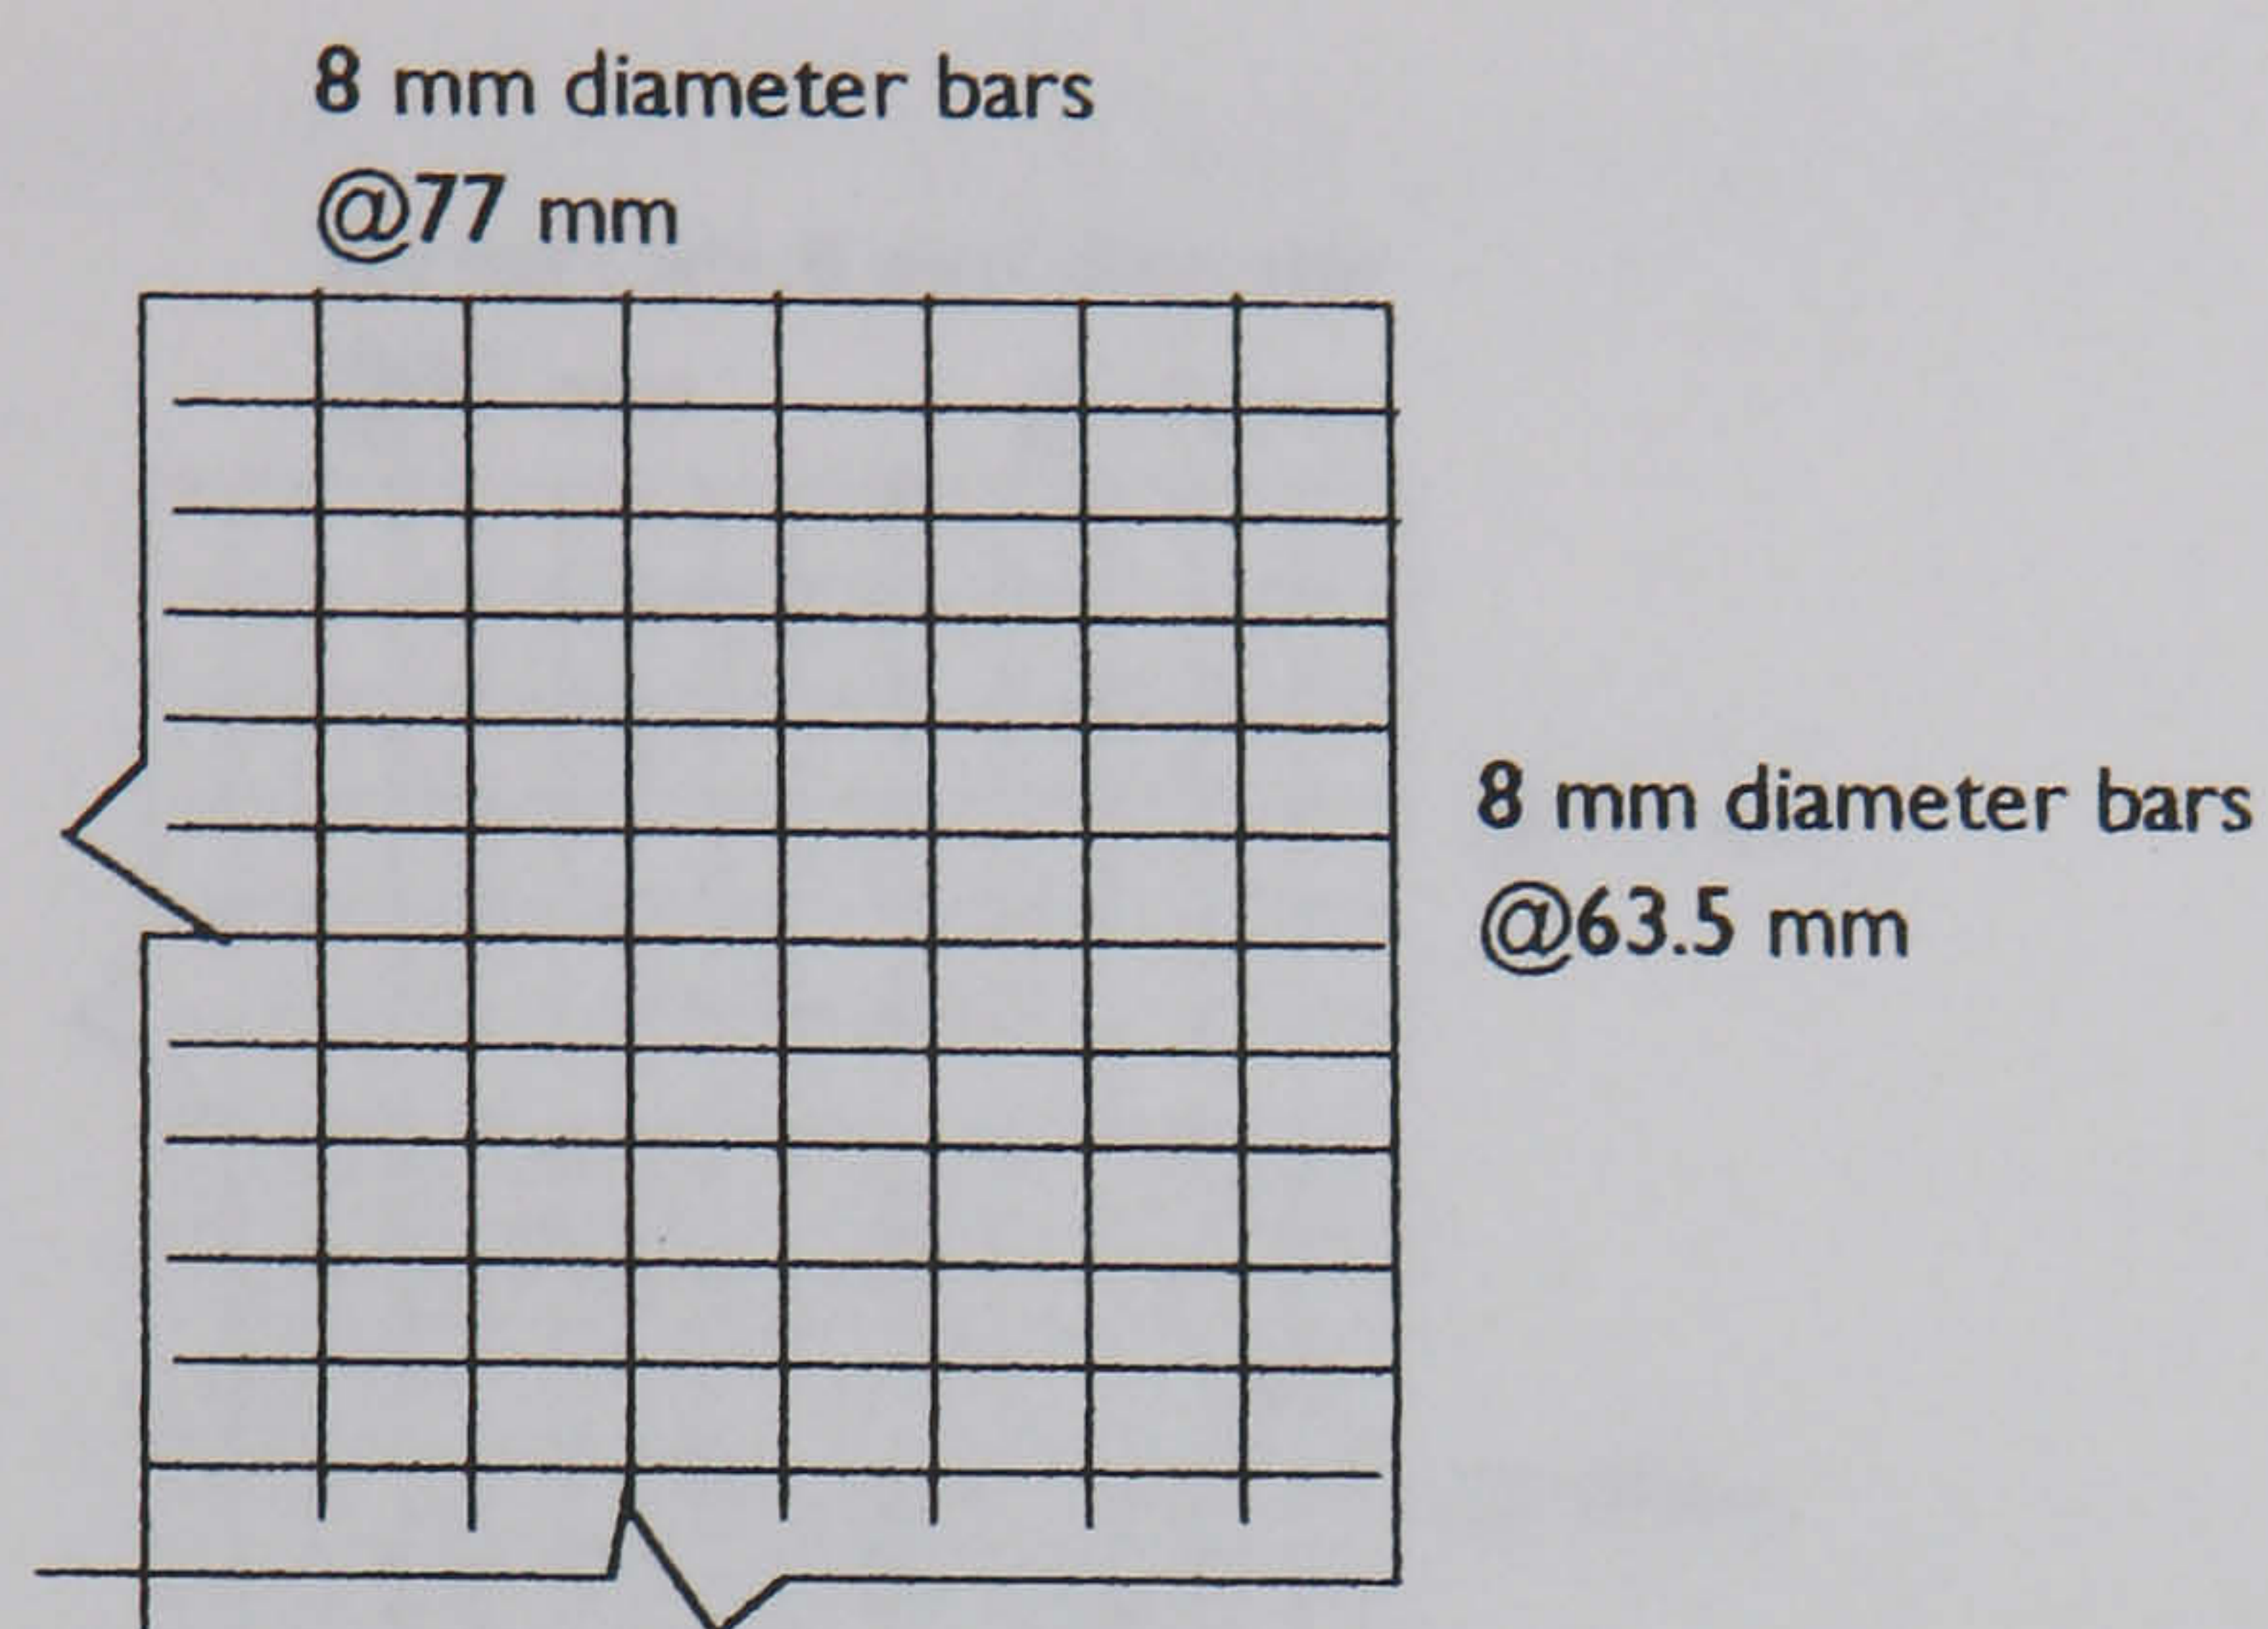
Steel layout for Taylor's [8] slab No.1.
